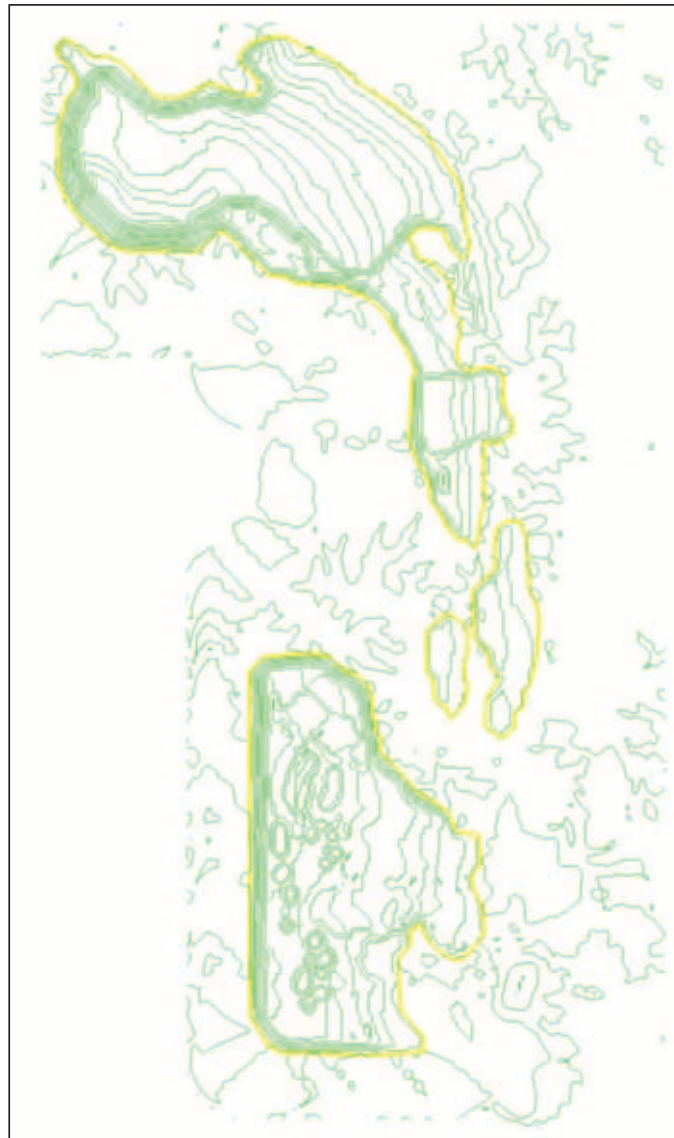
7 Pit shell selection & Final Pit Design – BS Block
